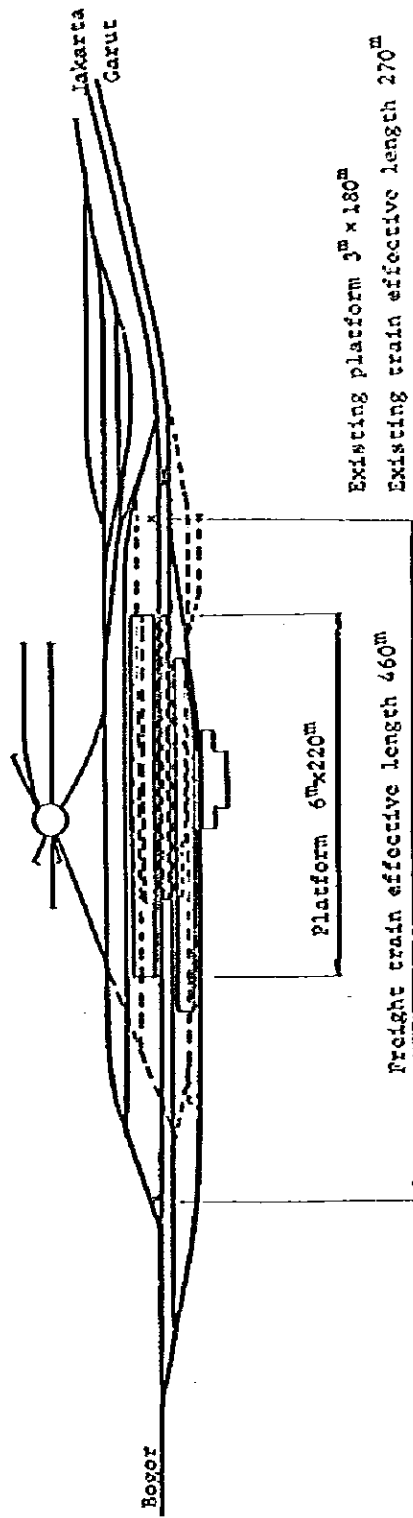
Cibatu Station Yard Track Layout Plan
